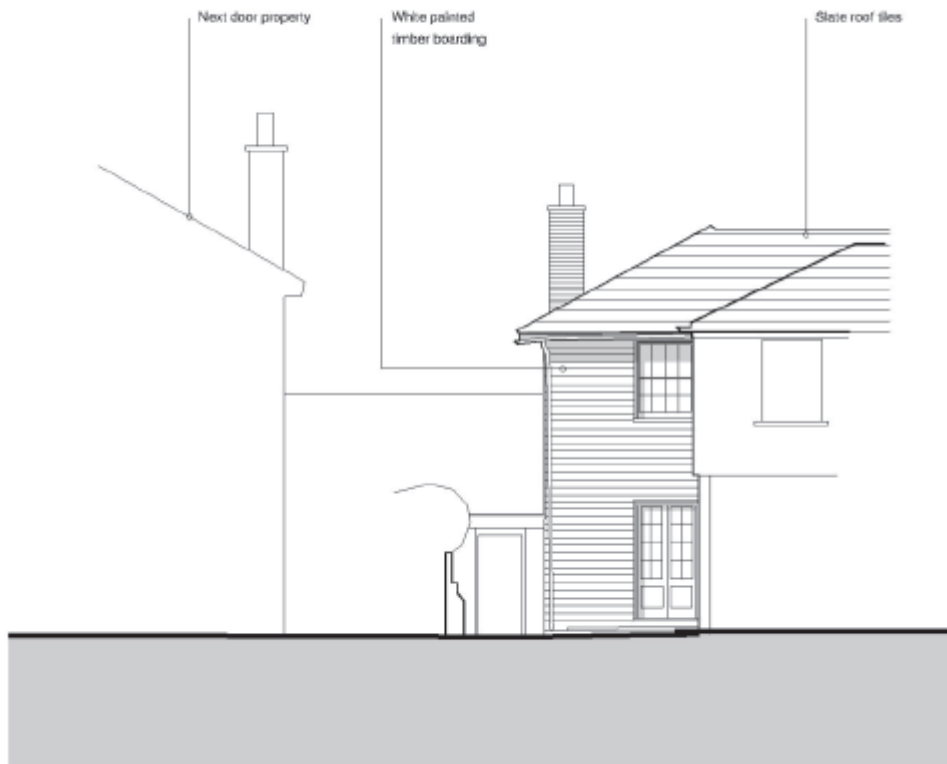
The rear elevation showing the single window at first floor to be replaced.
